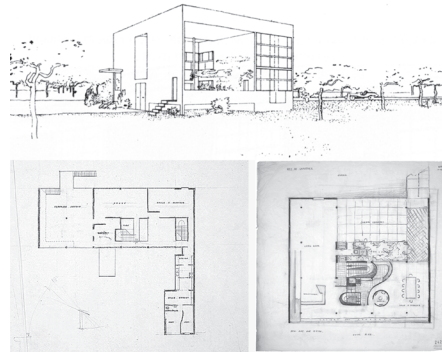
Suburban house, rear axonometric. Fig.7c - Stein-de Monzie house, main floor plan with suspended garden (FLC 10409). Fig.7d - Ocampo house, main floor plan (FLC 24232).
